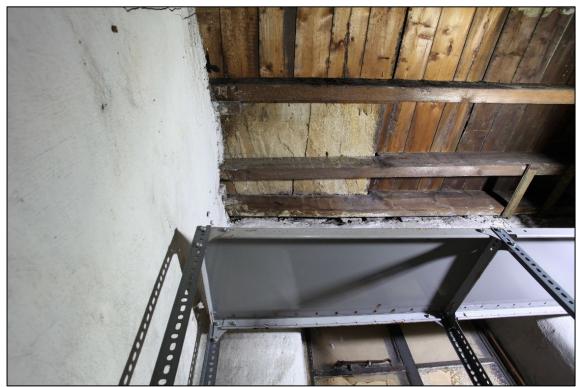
Detail of hearth base above room 4 (within room 7), facing up towards the north
